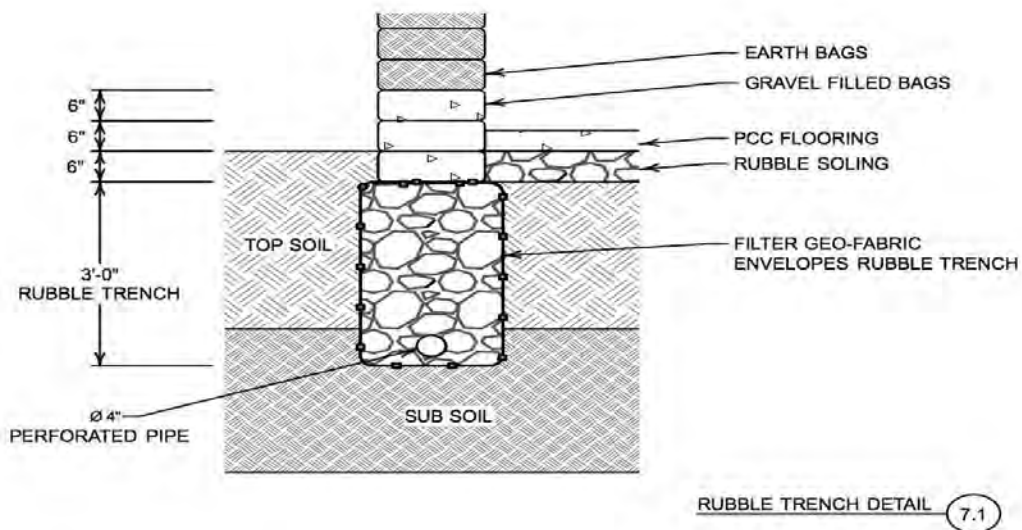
Rubble Trench Foundation (Geiger, O., 2013)
